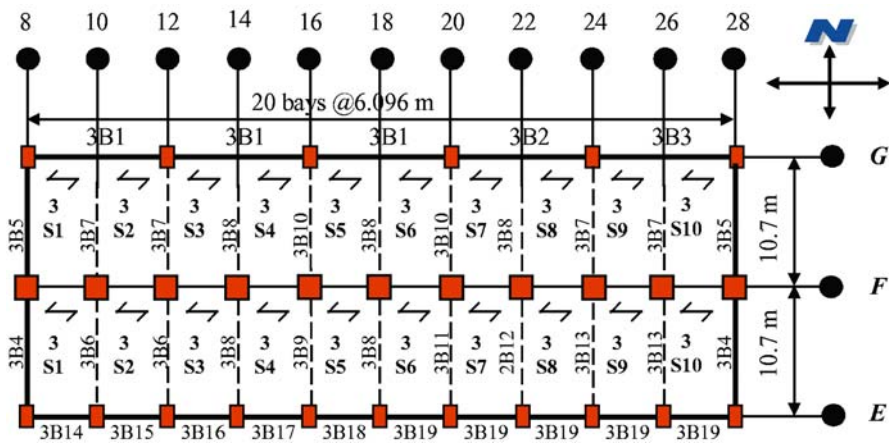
Plan of the second floor (not to scale). Courtesy: Kirkpatrick Consultants, Oklahoma, U.S.A., 2002, T. Bangash, Ph.D. Thesis, London University, 2004
